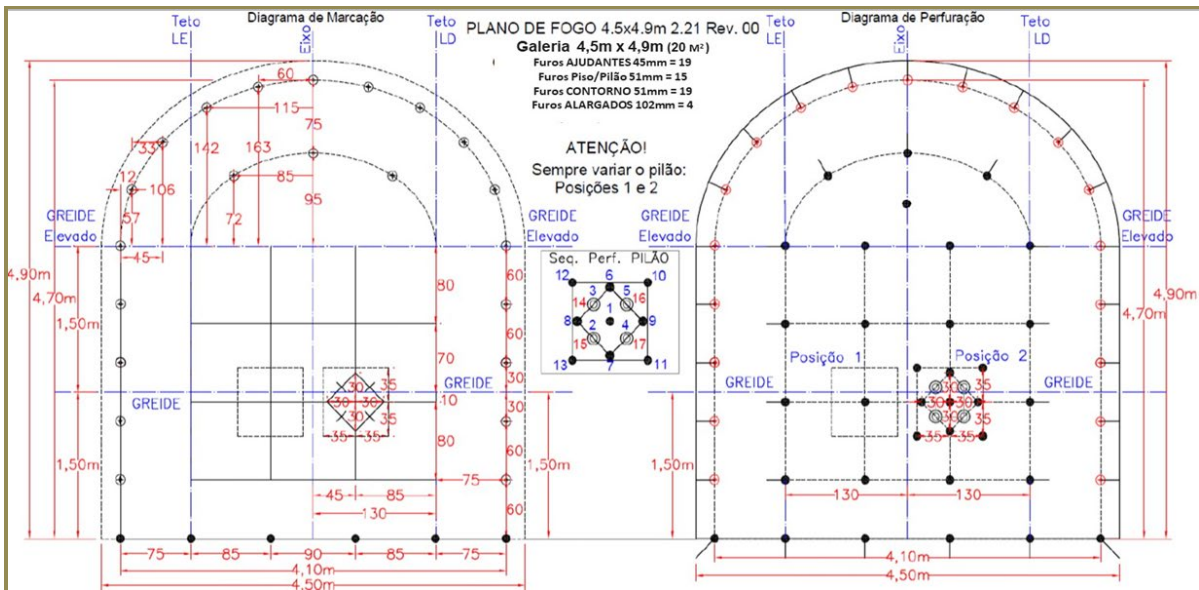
Typical Development Headings Drill and Blast Pattern
